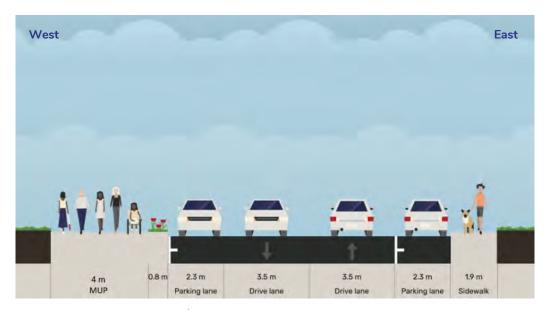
Recommended 4th Street Cross-Section Between C Avenue and B Avenue
